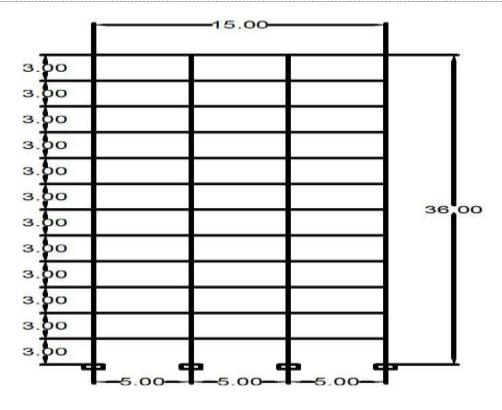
Elevation of 12 storey building without bracing in transverse direction
